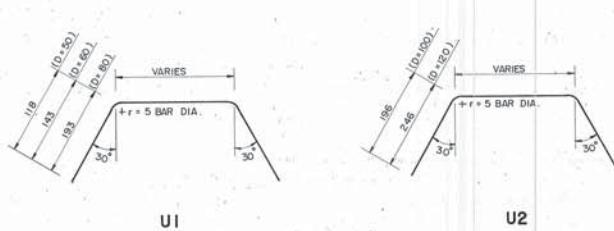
& Ø120 PIPE CULVERTS
